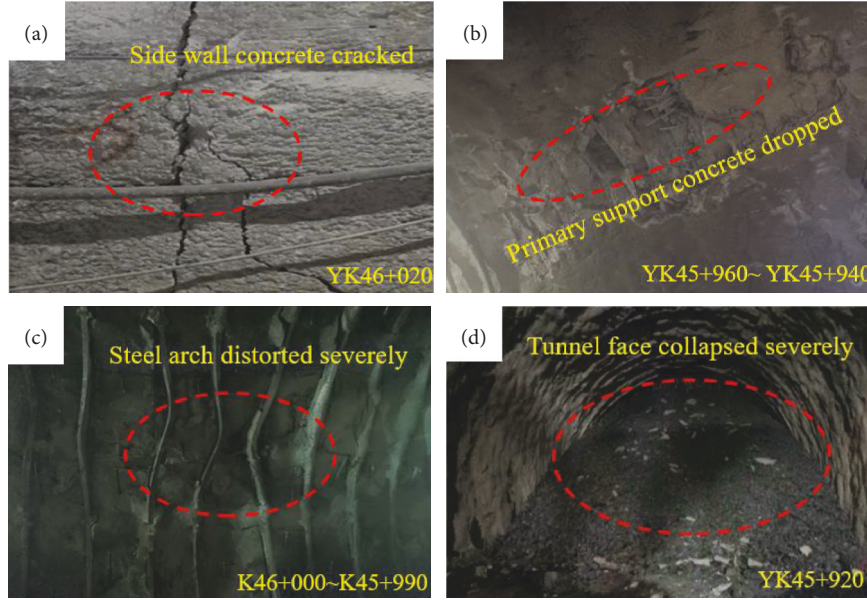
Damaging phenomena caused by large deformation of soft rock under high geo-stress: (a) side wall concrete cracked; (b) primary support concrete dropped; (c) steel arch distorted severely; (d) tunnel face collapsed severely.
